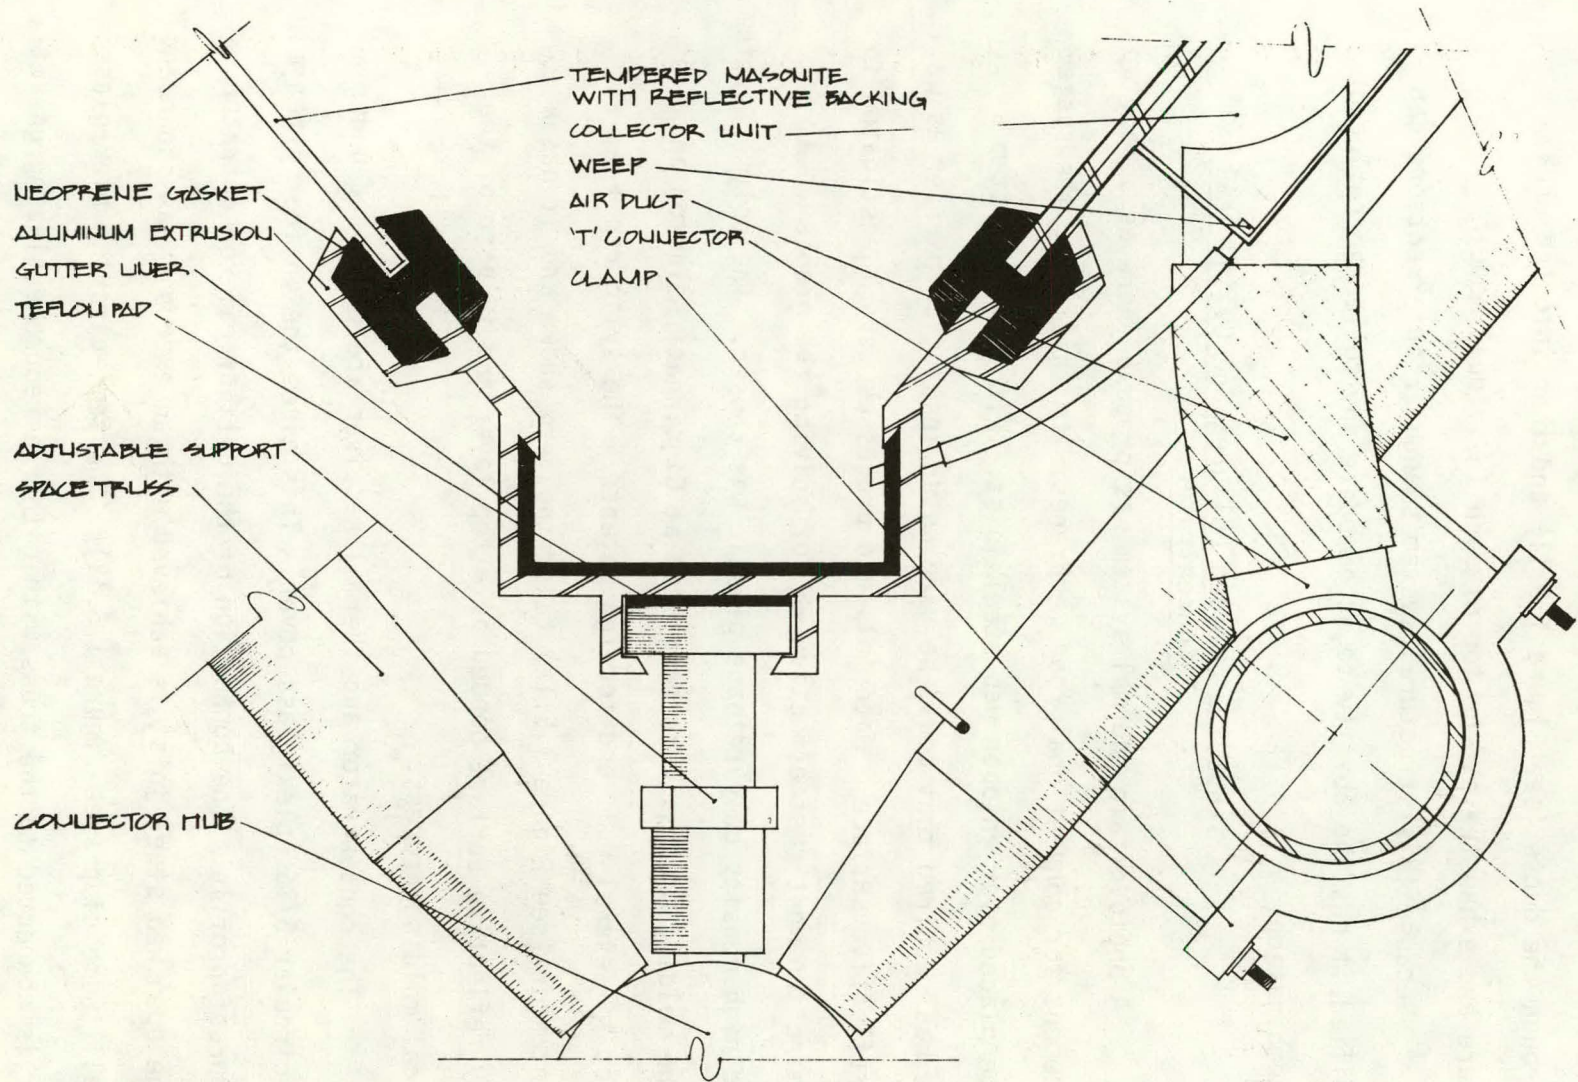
Roof truss detail, bottom joint and air ducts
